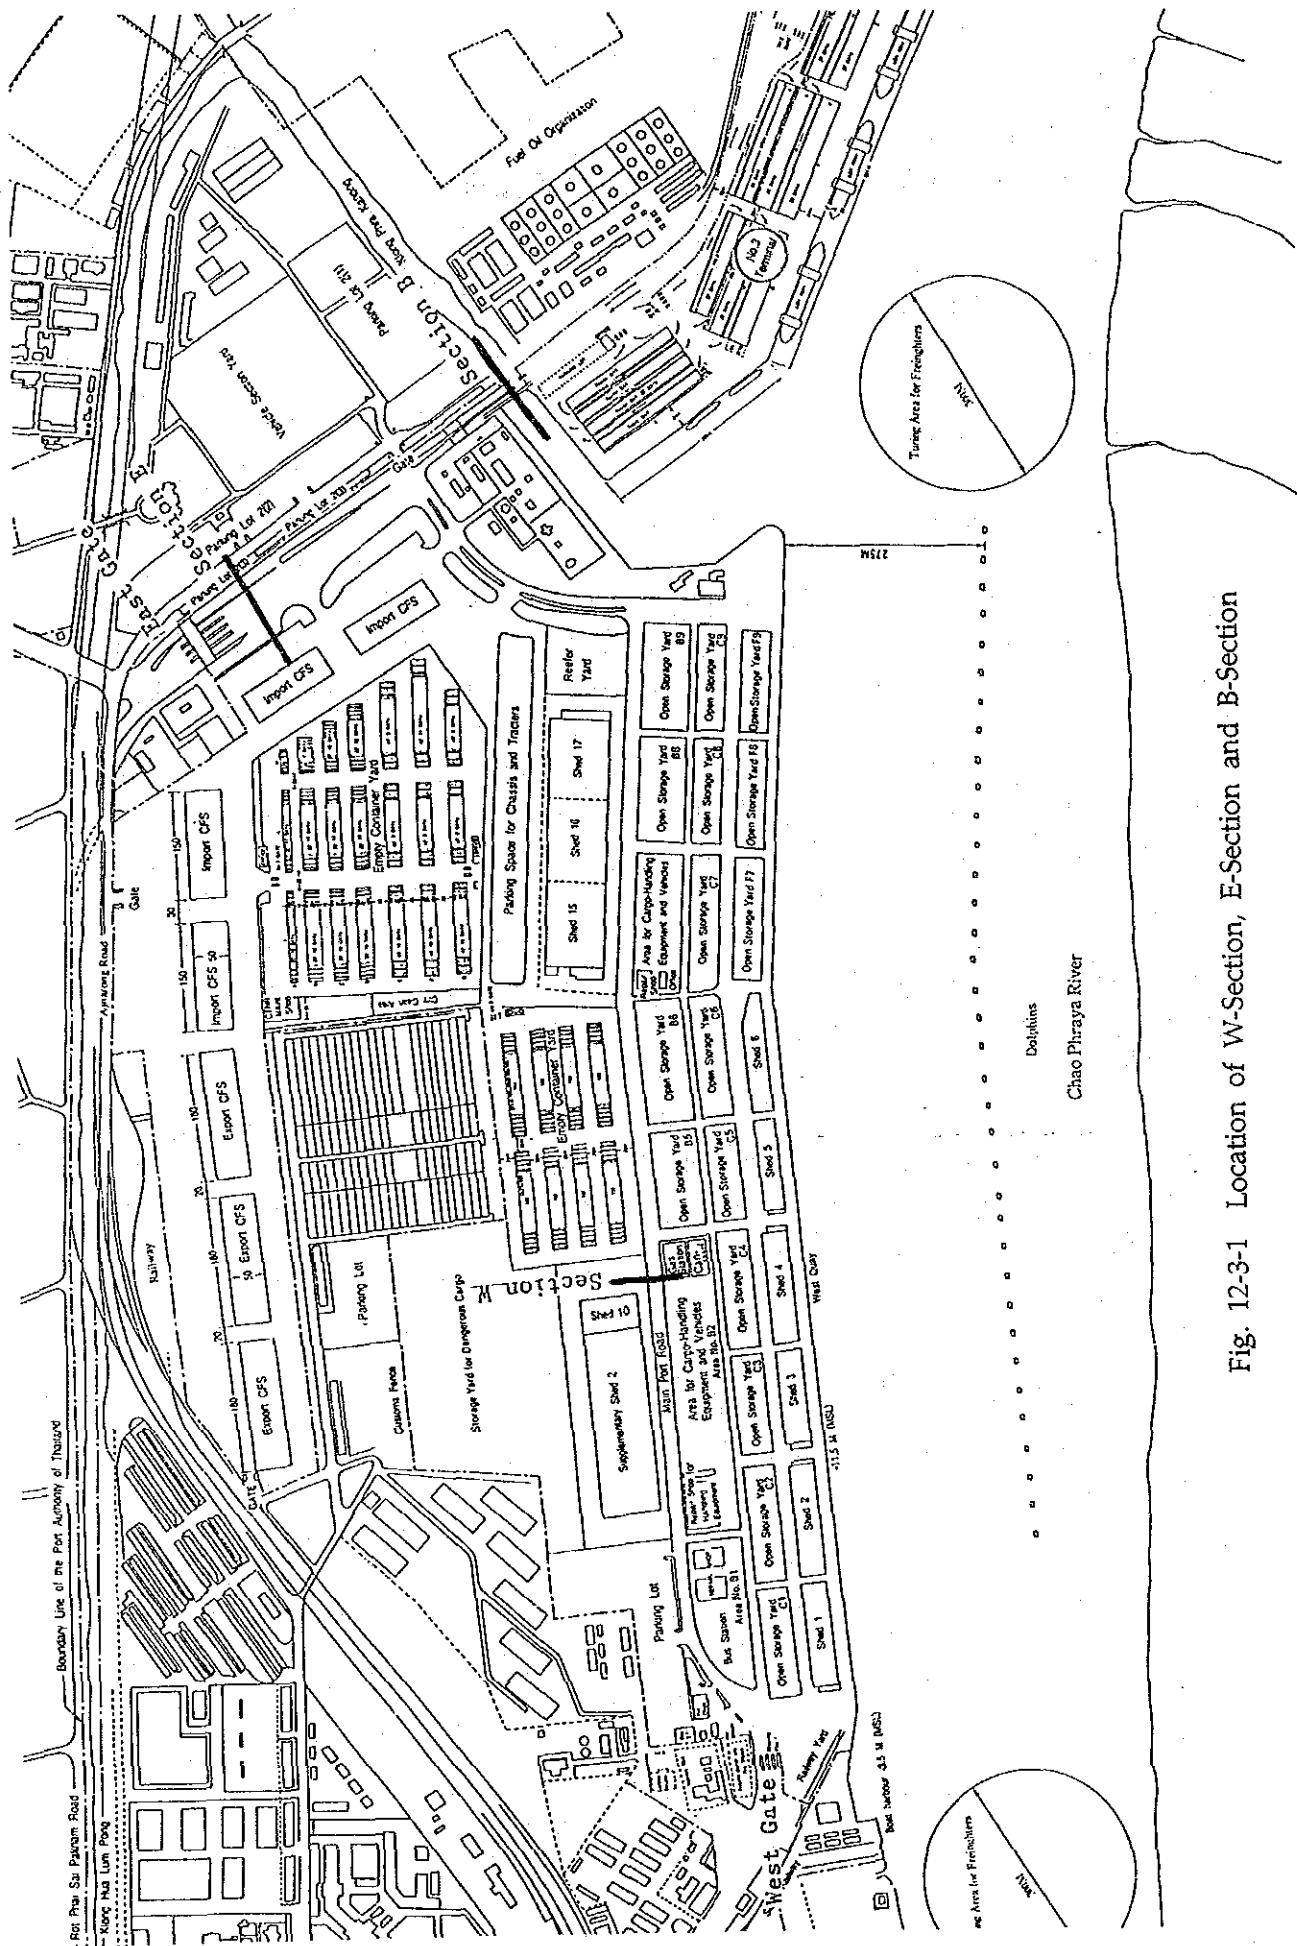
Location of W-Section, E-Section and B-Section
